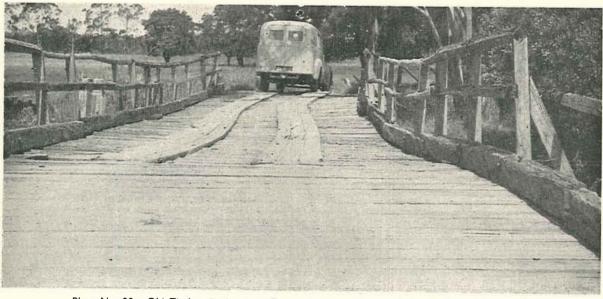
Old Timber Bridge over Tarago River on Morrison's Road, Shire of Buln Buln.
